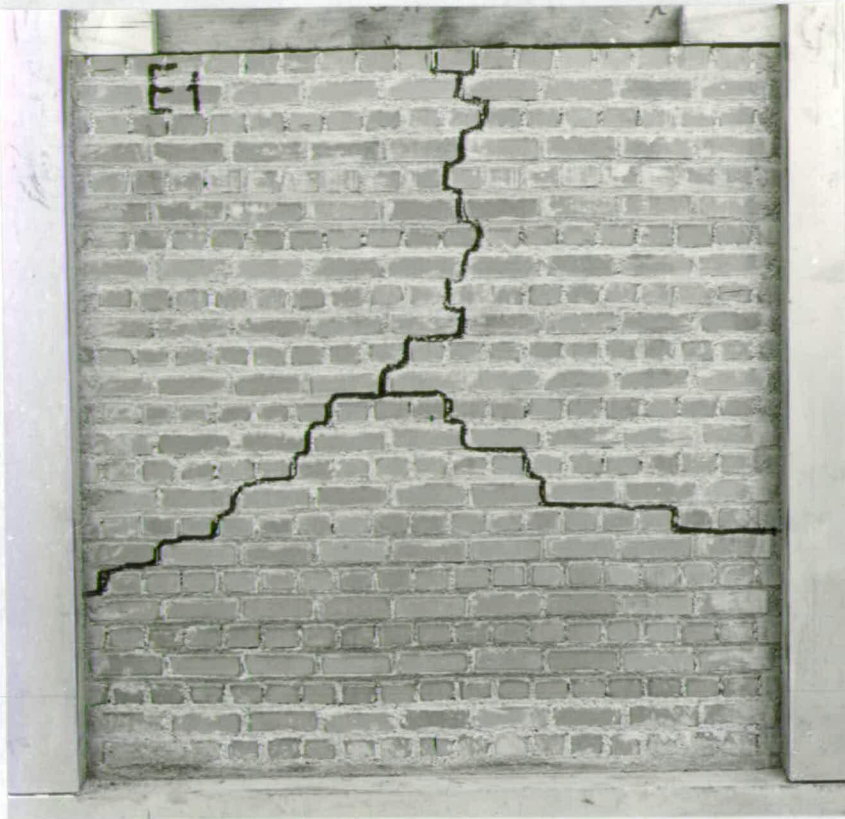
FAILURE OF WALL E1 - 3 SIDES SUPPORTED
